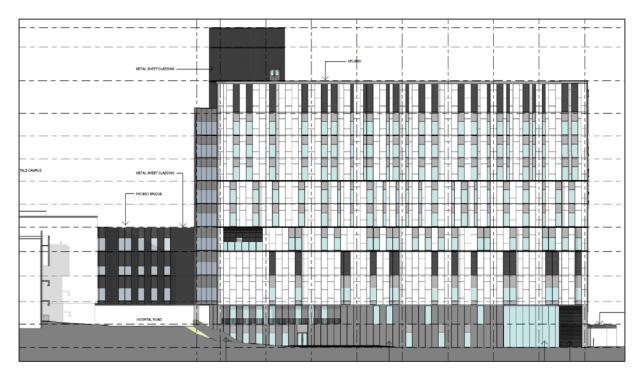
| North Elevation (Source: Applicant's Additional Information)
